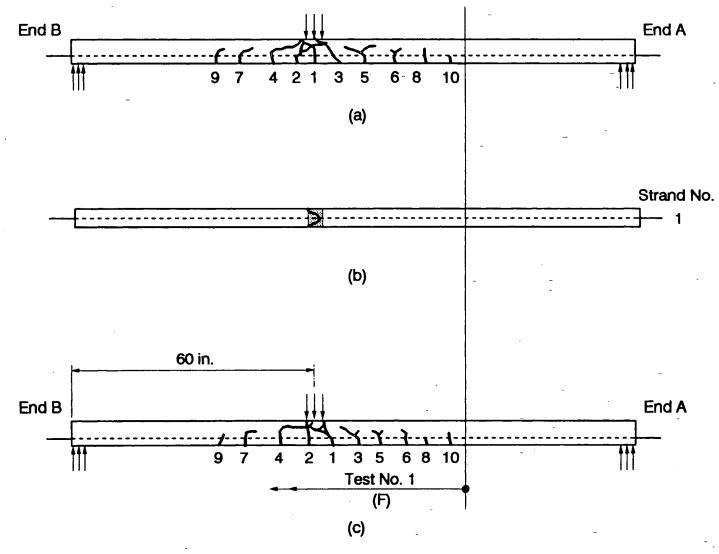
Crack pattern for D-type Specimen No. 11-6.0DU-1:
